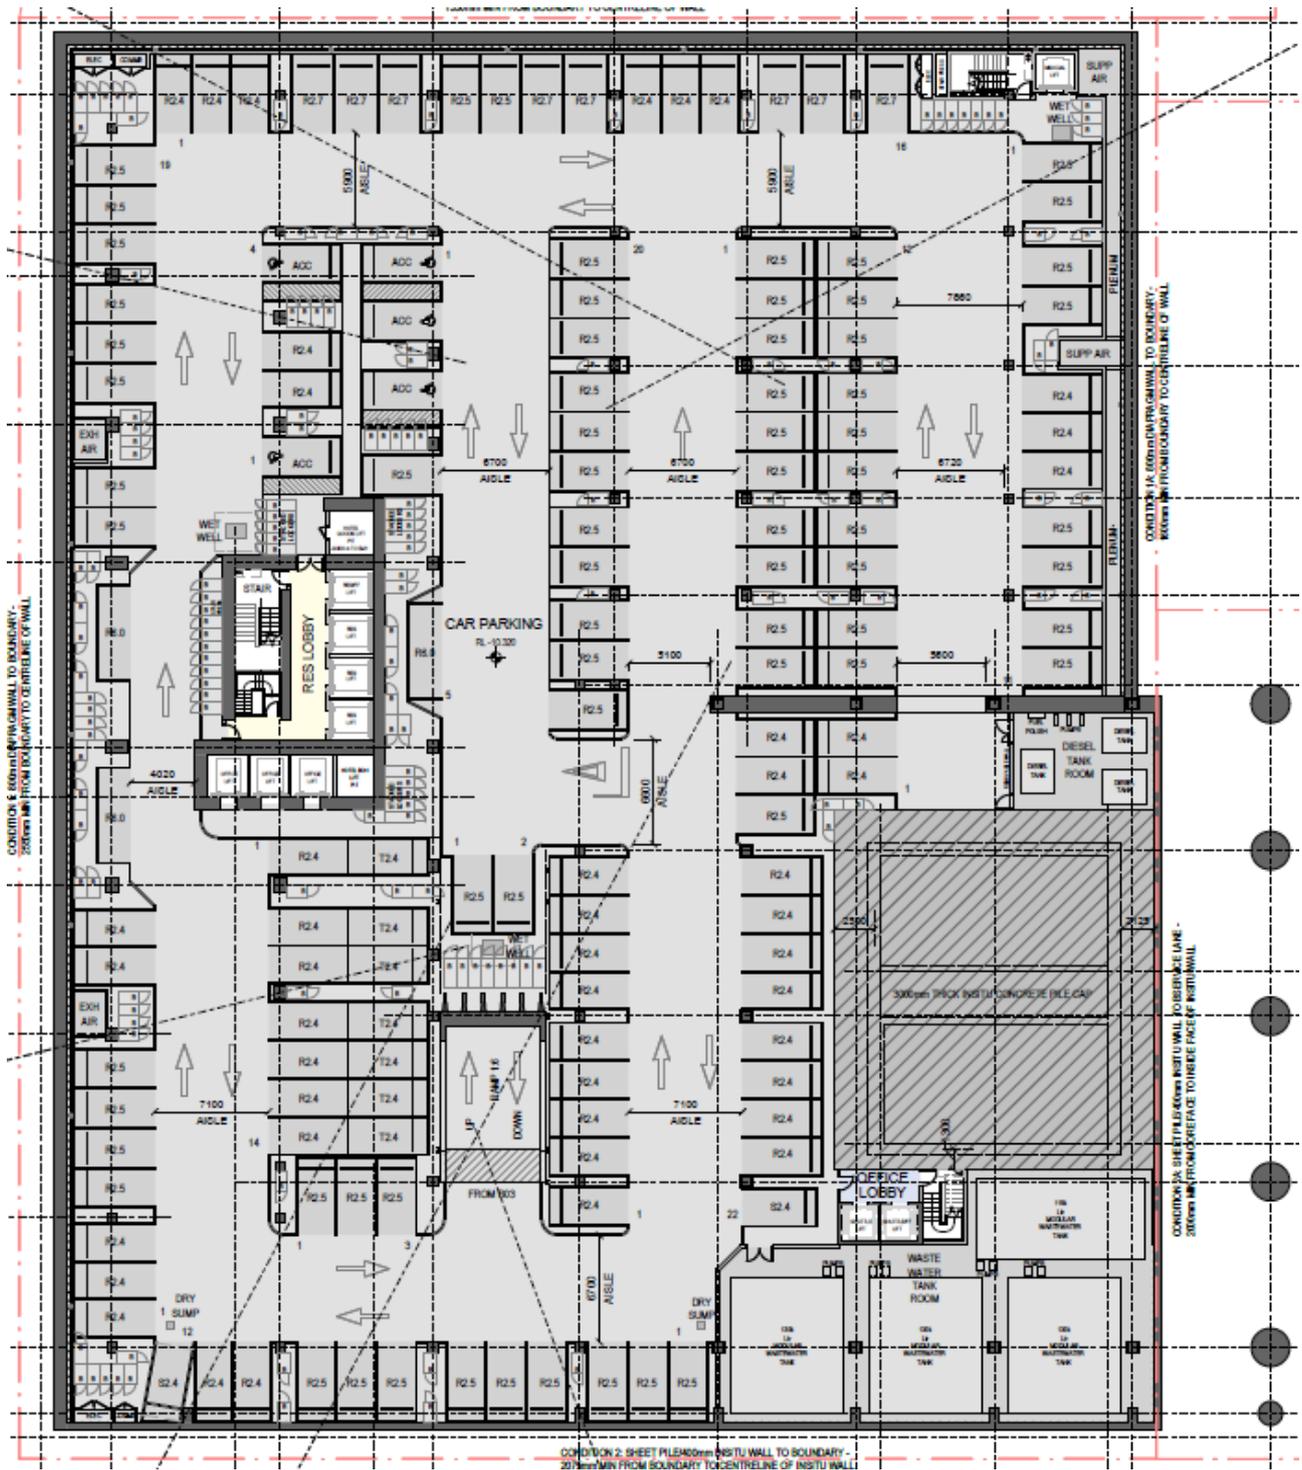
Level B04 layout – alternative layout with 9 parking spaces instead of water tanks (see Section 8.1.2)
